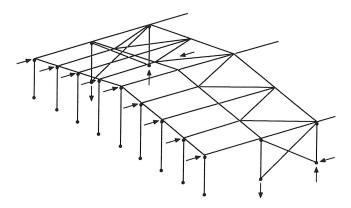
Transfer of wind loads from gable columns through roof and wall bracing.
